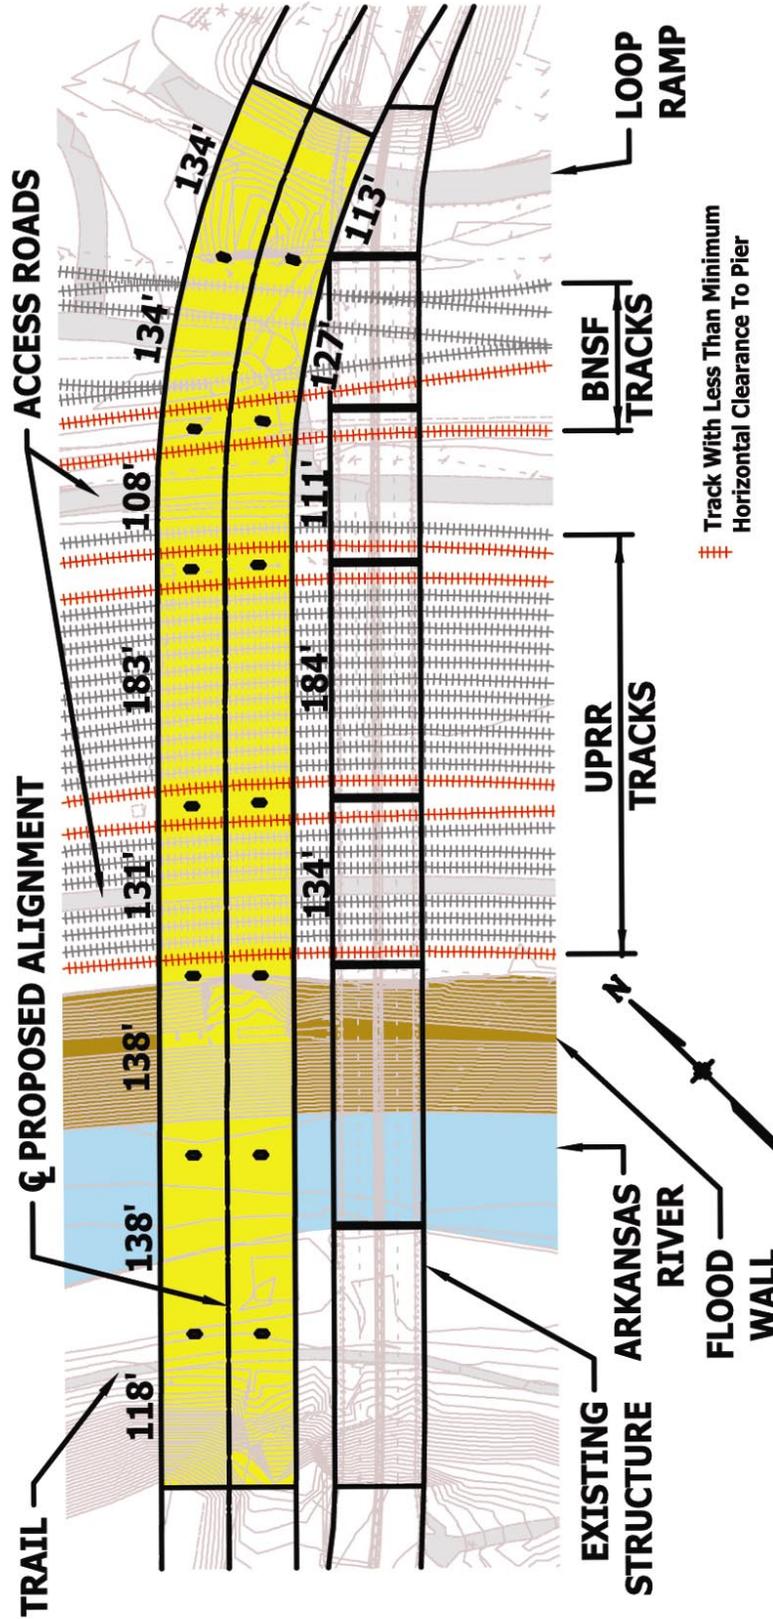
Match Existing RR Spans w/ Modified River Spans - Plan
